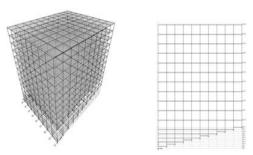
3-D View and Elevation of a Step back building for Storey 10 (10° Slope)
